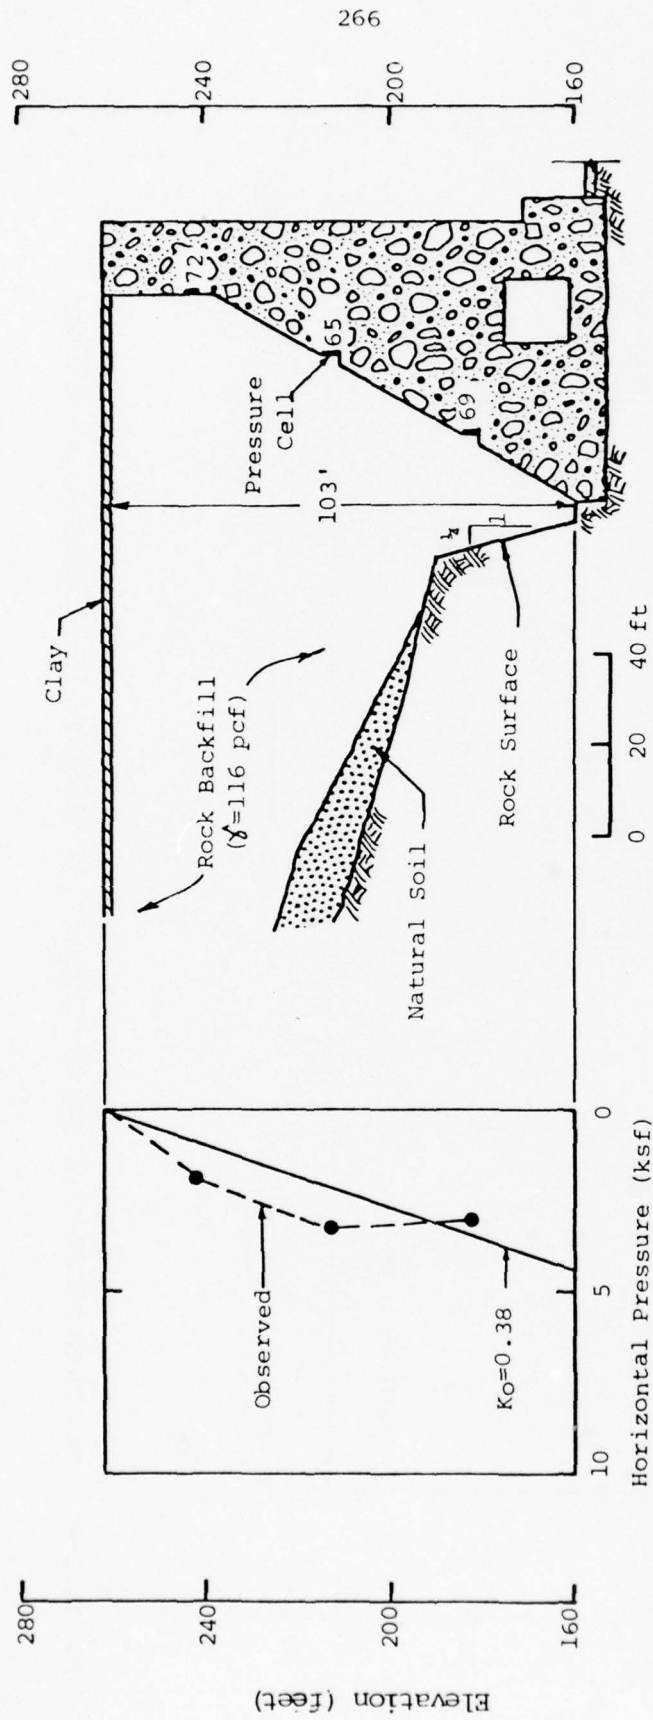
TOTAL EARTH PRESSURES AT END OF CONSTRUCTION, MONOLITH 13L, BANKHEAD LOCK AND DAM
